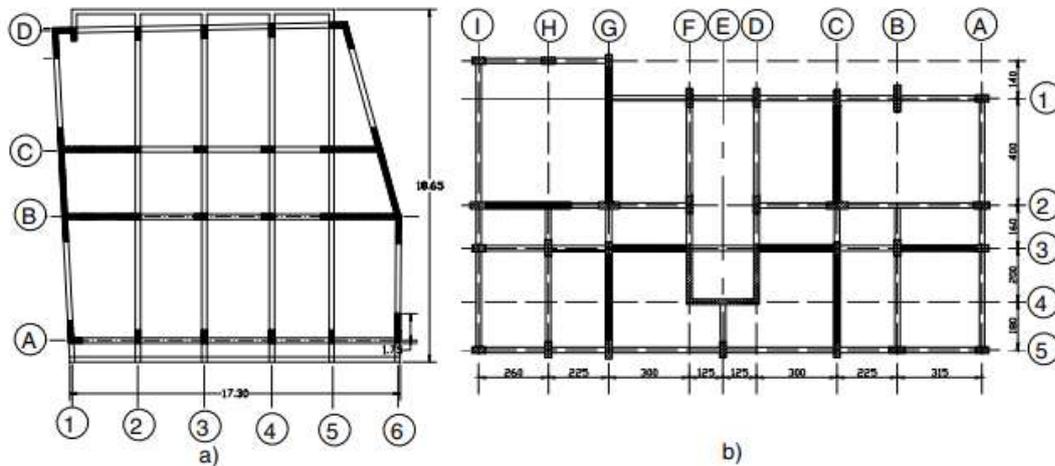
Rehabilitation scheme applied to the ground story plan of a) the four-story building in Dinar, b) the eight-story building in Ceyhan.
